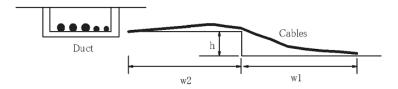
Cable deformation due to the uneven sinking of the duct
